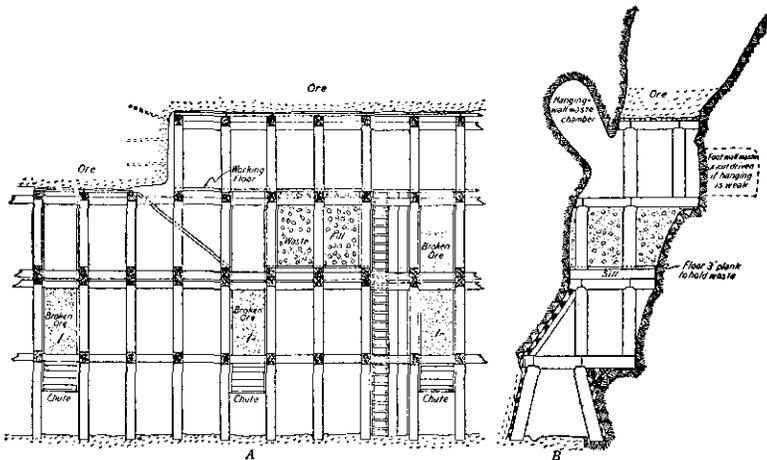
Square-set stope, Argonaut mine: A, Longitudinal section; B, cross section
